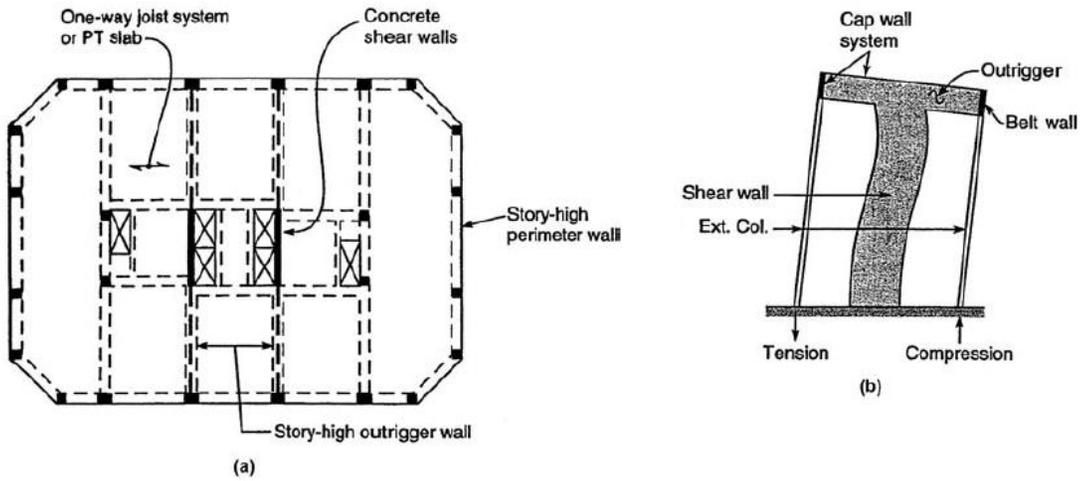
Building with cap wall: (a) schematic plan; (b) structural behavior.
